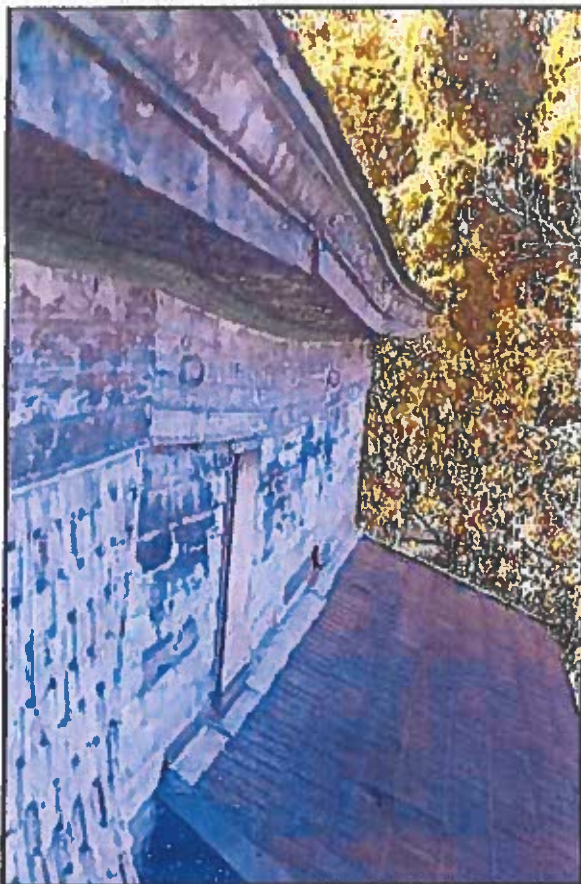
North facade of ell barn at loft level showing substantial sag in roof cornice and wall below. The sag does not extend into the first floor below indicating it may have been stabilized when the first floor was rebuilt c. 1930s.
